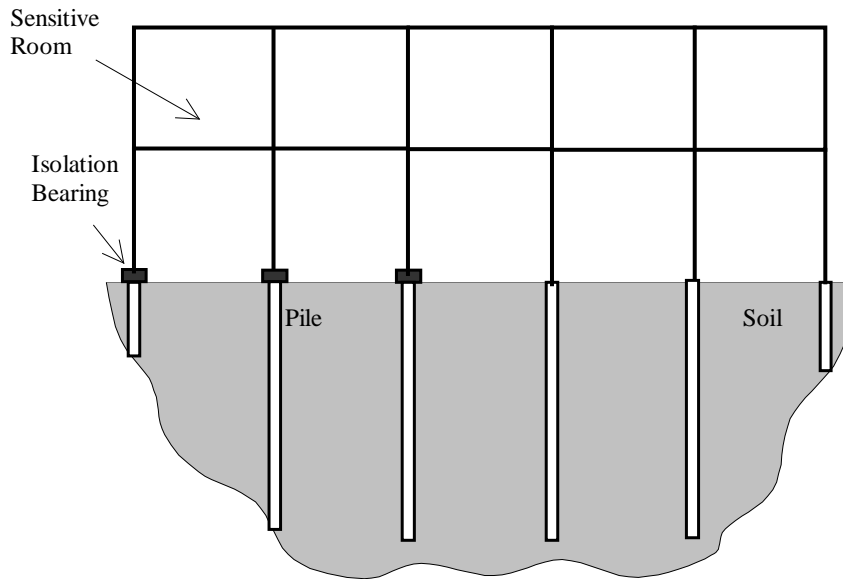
Schematic diagram of a partially isolated building founded on a piled foundation.
